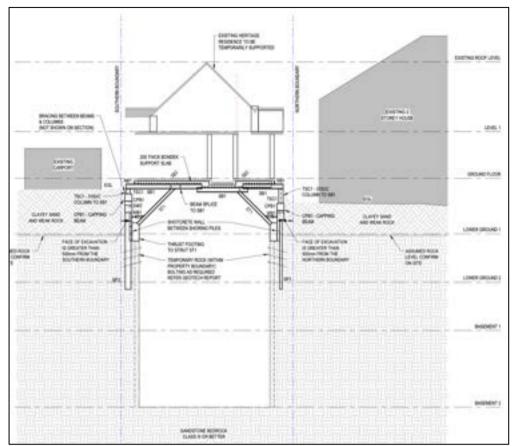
Section 1 Source: ACOR Consultants structural Drawings
